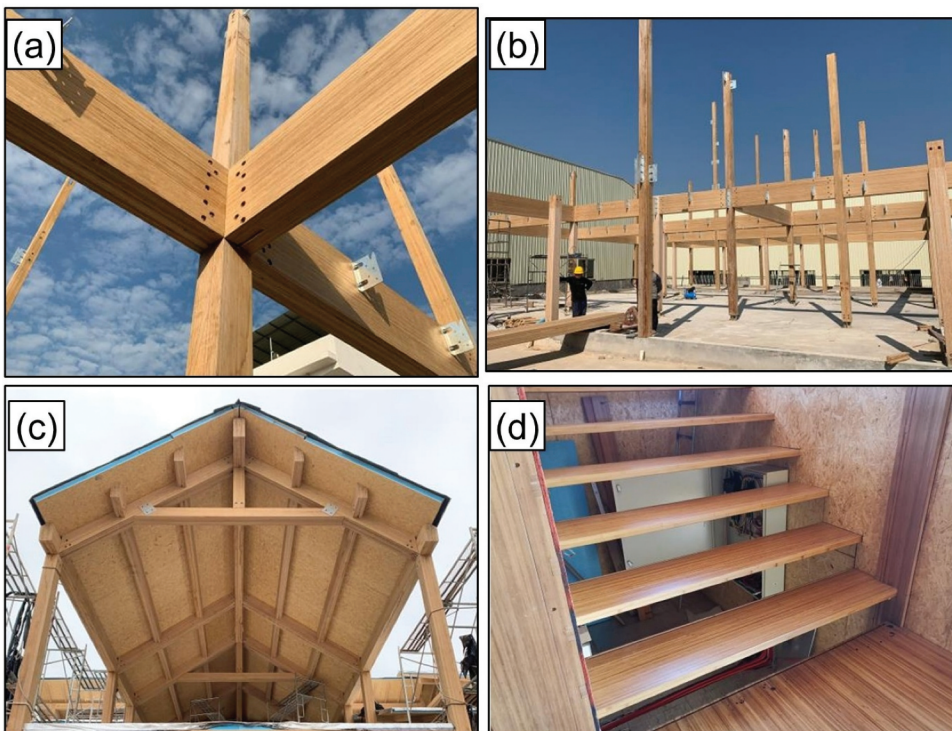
LBL building construction of (a) connections between columns and beams, (b) structural system for the first floor, (c) inner side of the roof, and (d) stairs (reproduced under terms of the CC-BY license (Dauletbek, Li, and Lorenzo 2023), copyright 2021, sustainable development press limited).
